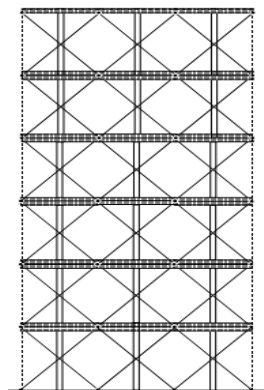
A Planar Shear Wall Modelled by Braced Wide Column Analogy wall,
